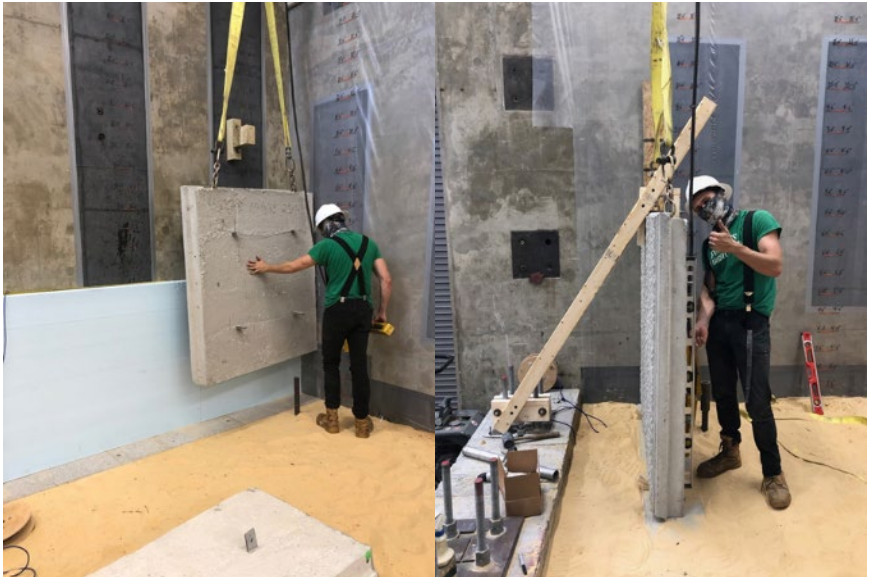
Placing first course of MSE wall panels, temporary bracing, and checking plumbness.
